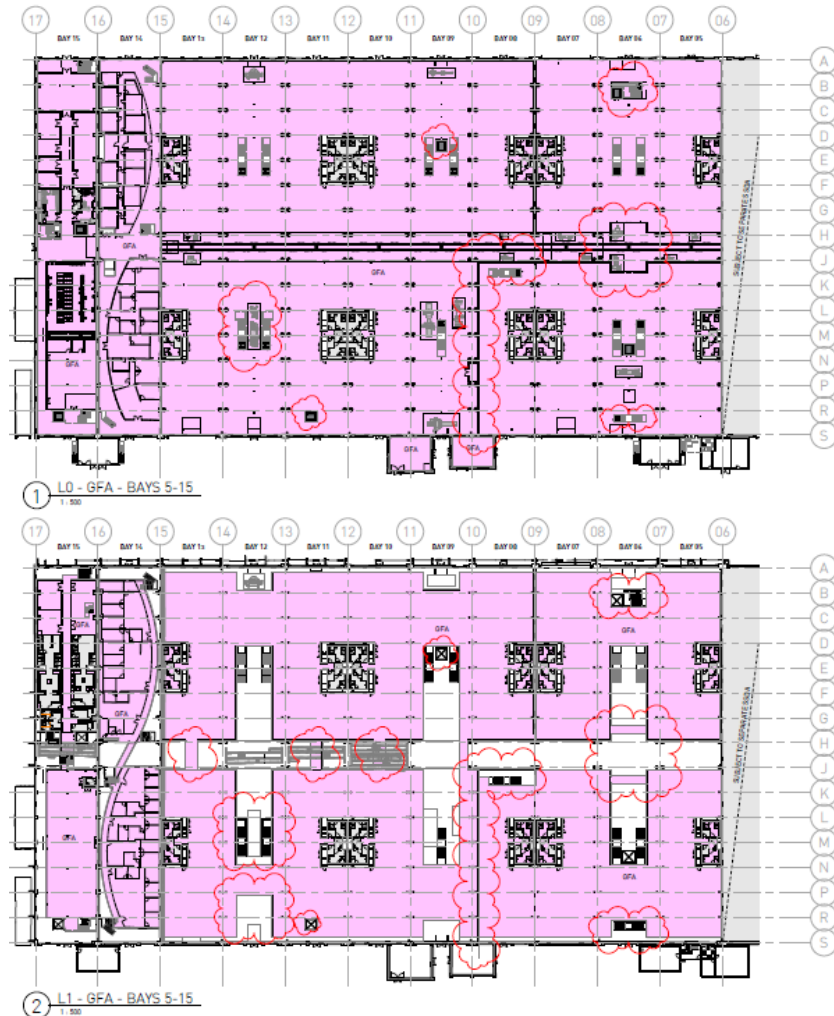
Approved GFA Ground and First Floor Plans (Source: Sissons, 2019)
